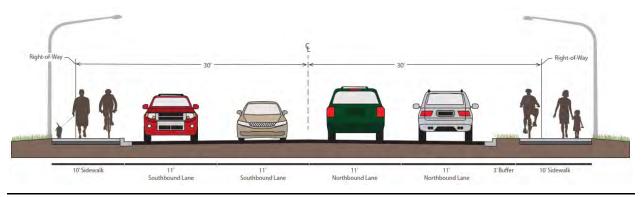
Proposed Typical Section – 17th Street to Warren Avenue Bridge
